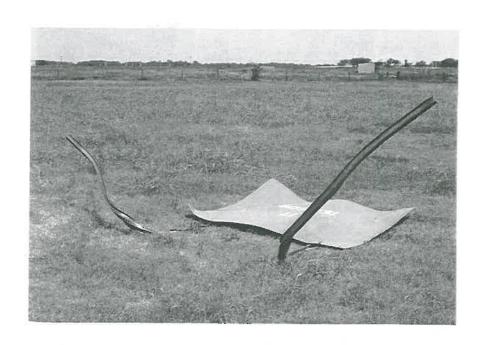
Dual 2-1/2 lb steel U-channel support installation anchored in strong soil after test 405231-11.
